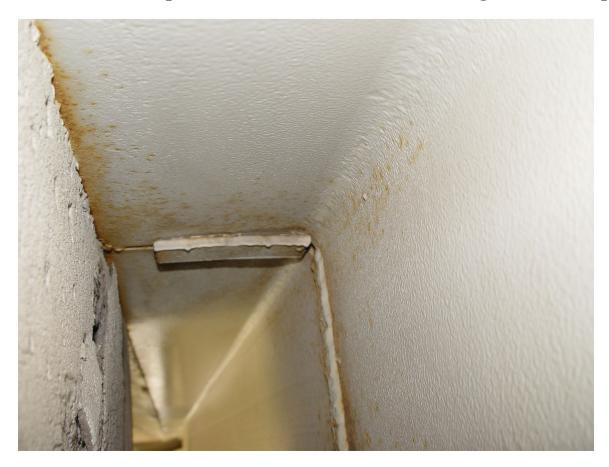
Close up of Photo 1, showing a backer bar used to weld the lower flange of beam 6 into the web of the pier cap.
